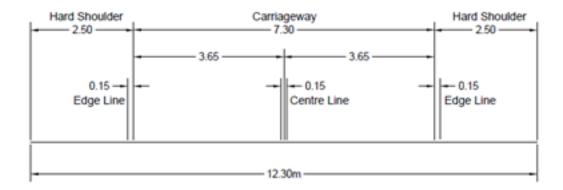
Type 1 Single Carriageway (S2) Cross-section
